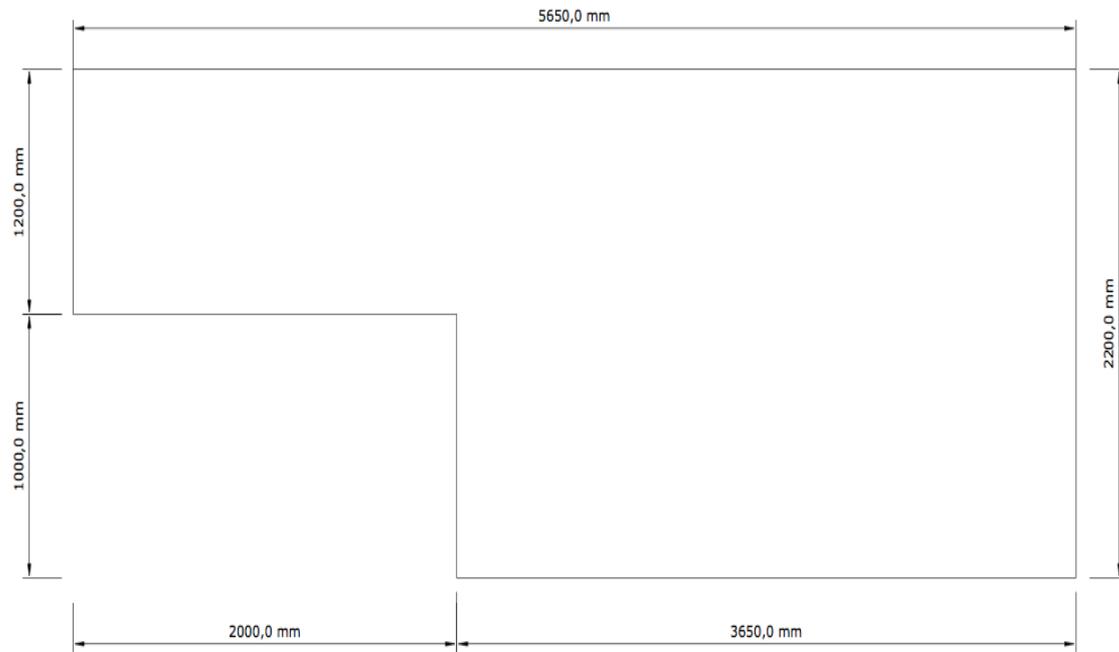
Sketch presenting the measurements of the floor area used in calculations. The measures have been carried out manually and may deviate some from the floor plan
